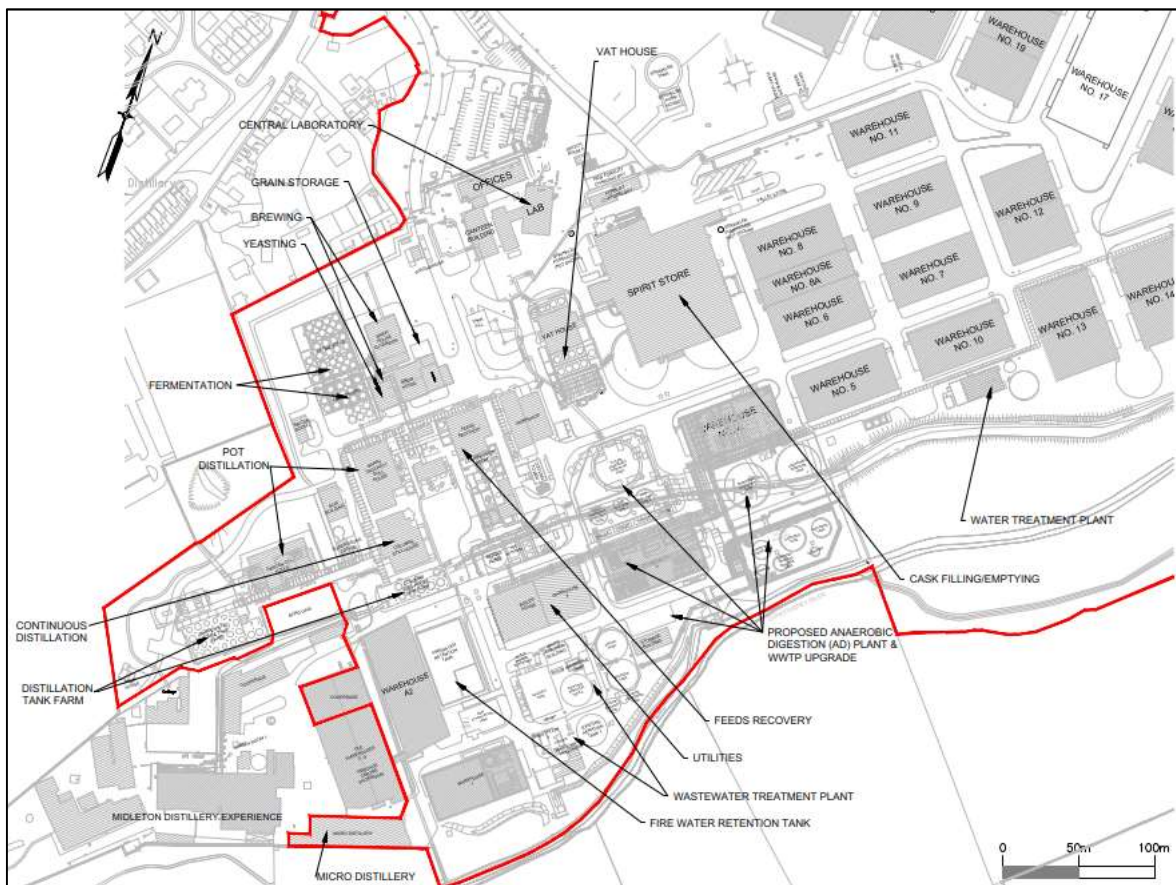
IDL Midleton, Site Layout showing Proposed upgraded WWTP and AD Plant, Proposed IE Licence Boundary in red
